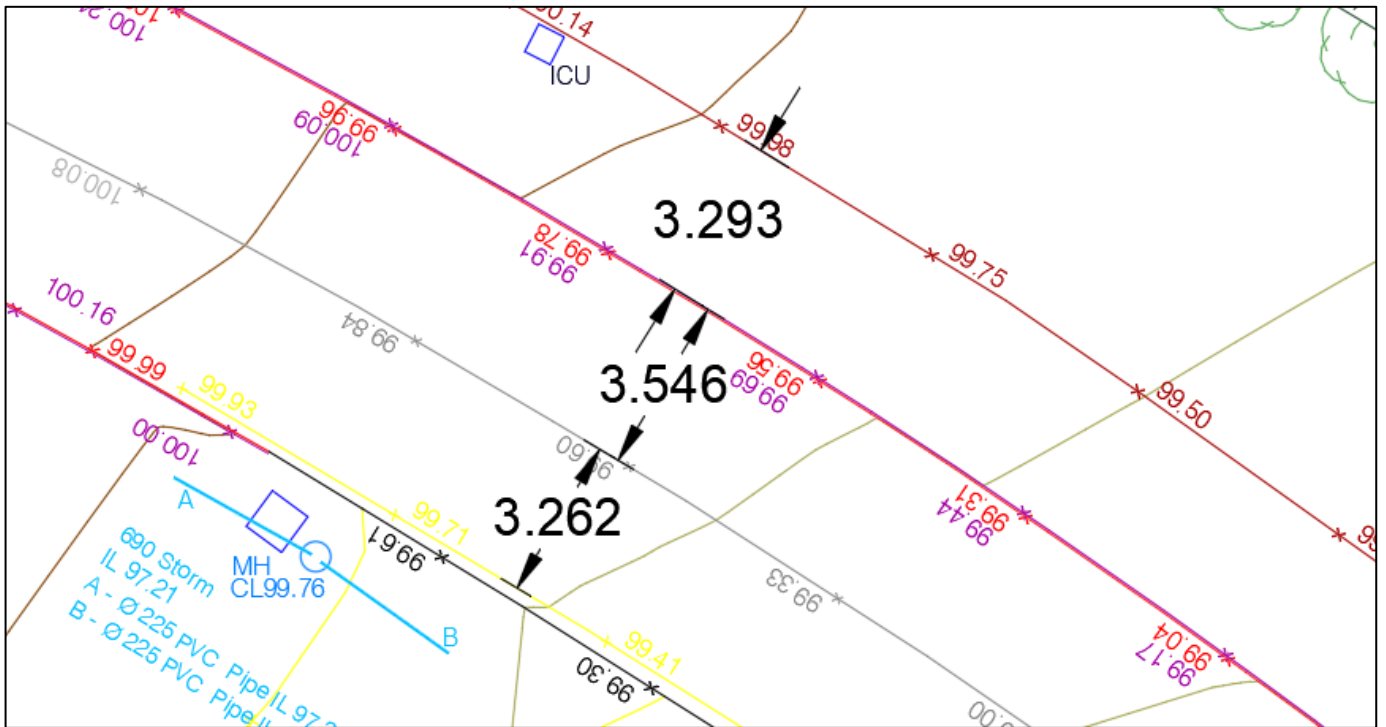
Cross Section of L1043 Killickabawn Road
